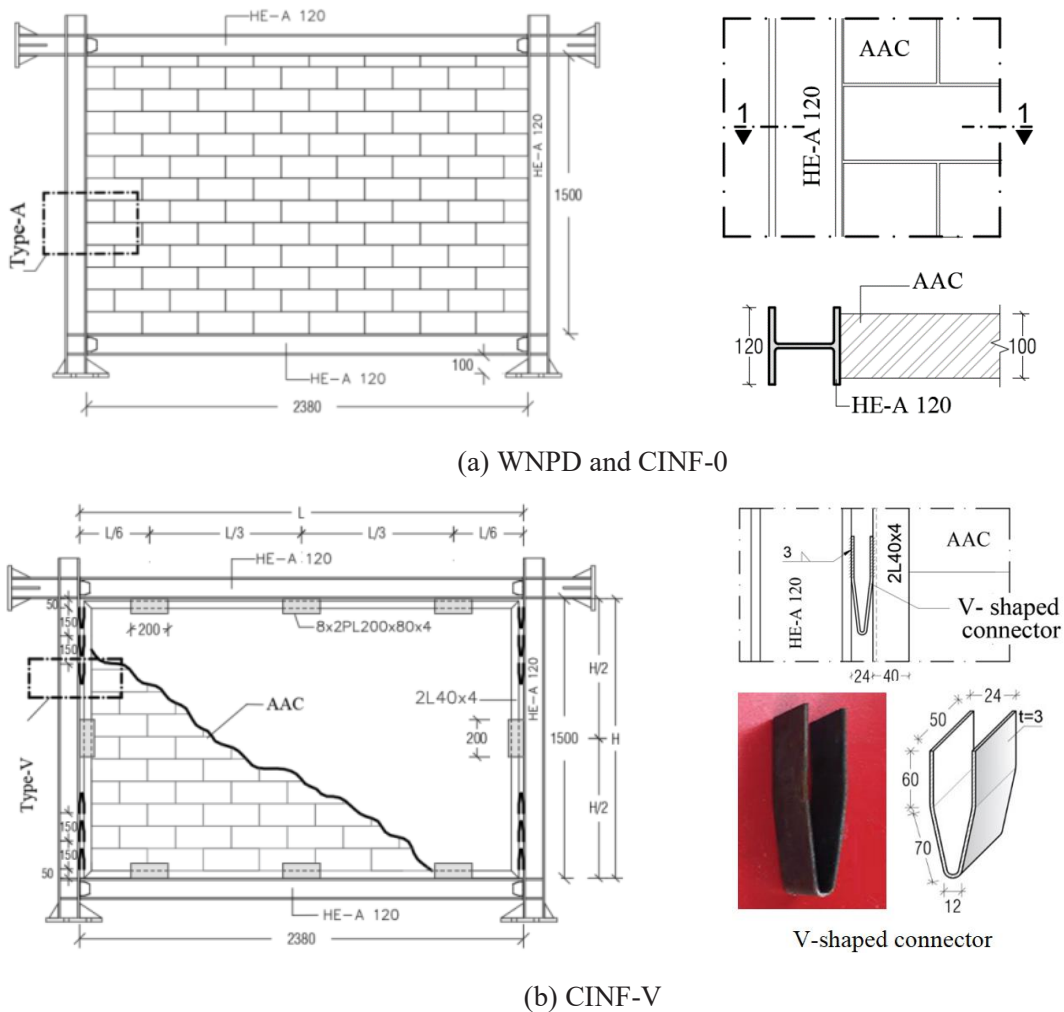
Detailed dimensions and configurations of specimens (unit: mm)
